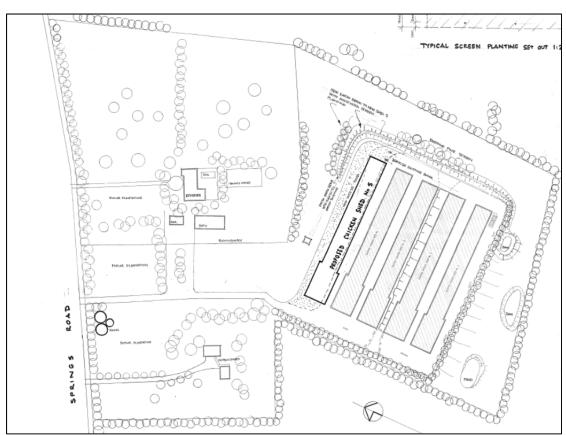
Plan showing the proposed location of the new shed (shown heavy black)
